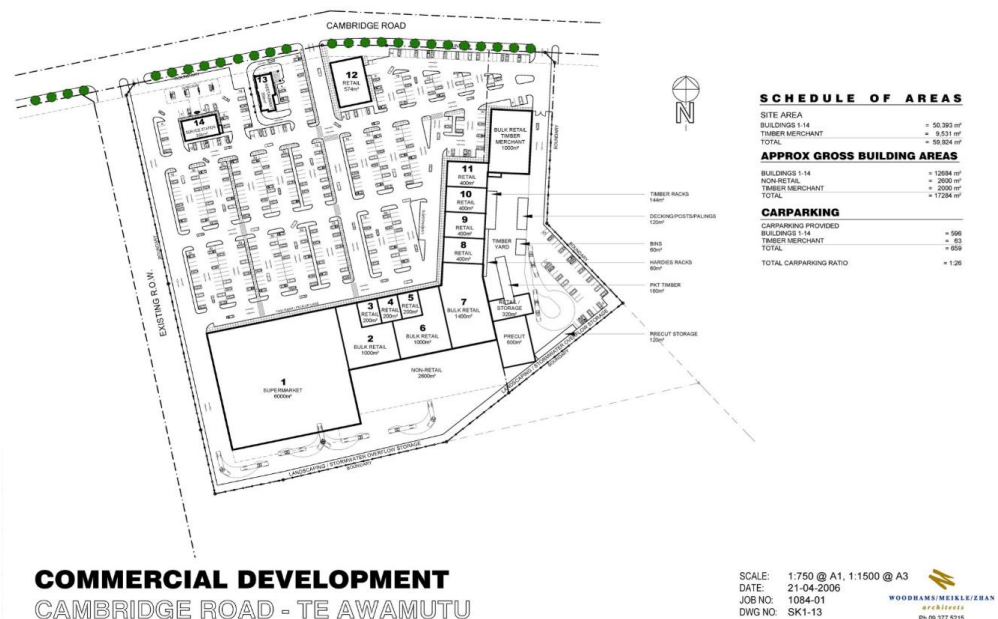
Te Awamutu Large Scale Retail Development Concept Plan
